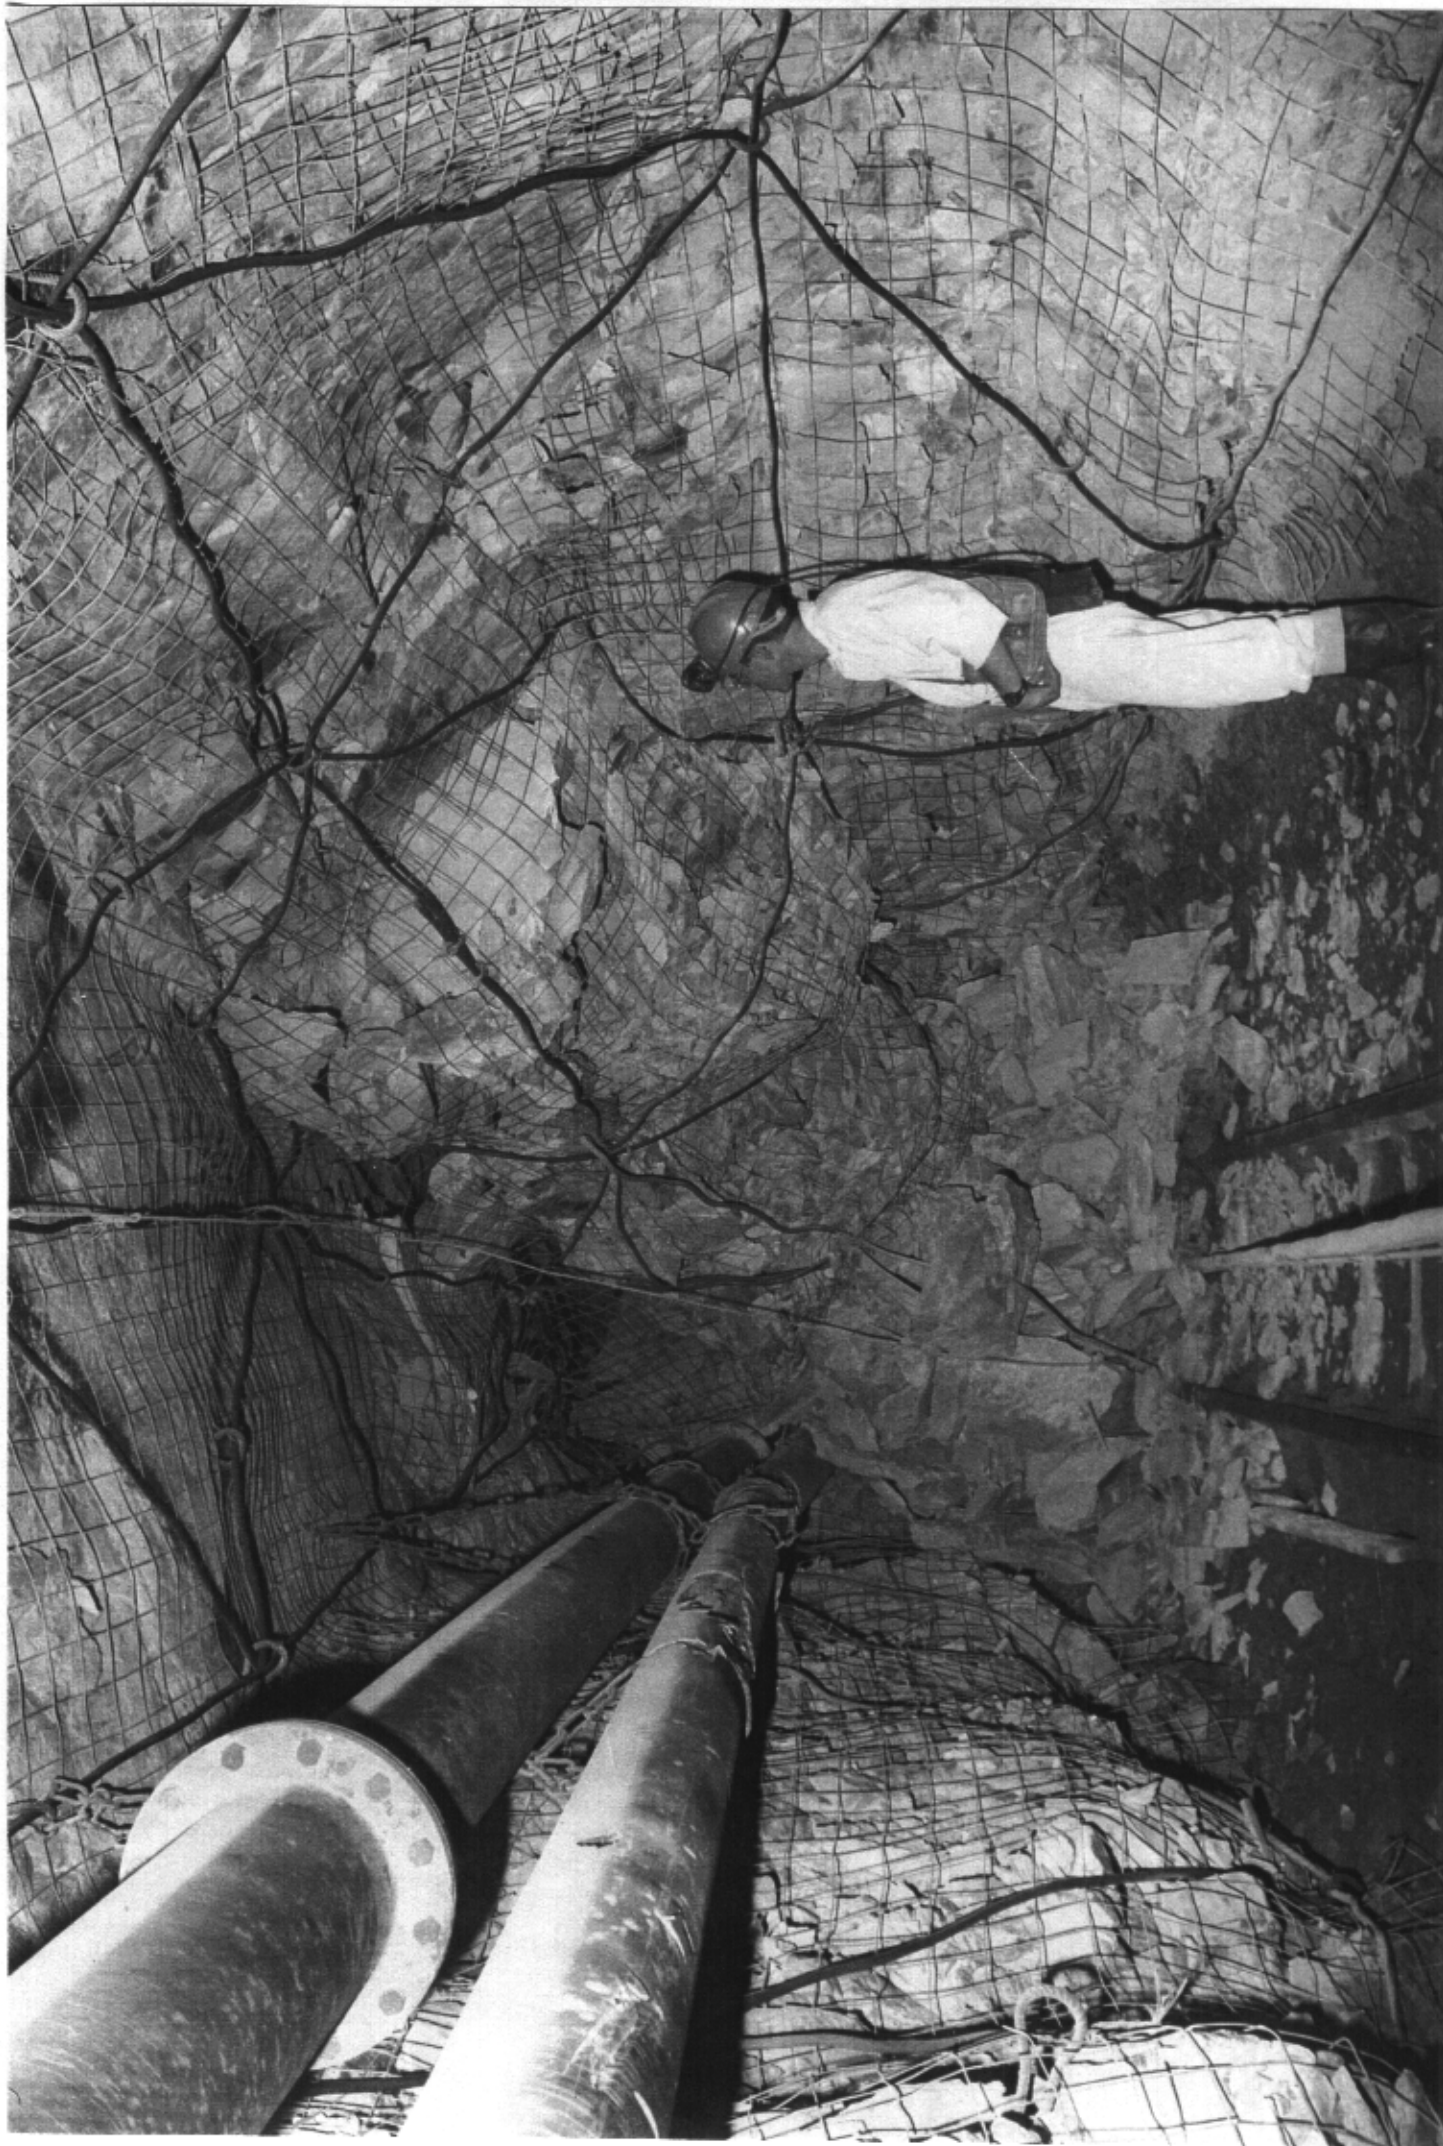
View along tunnel in footwall quartzite at 2500 m depth showing varying intensity of damage to support ranging from slight bulging to complete destruction.
